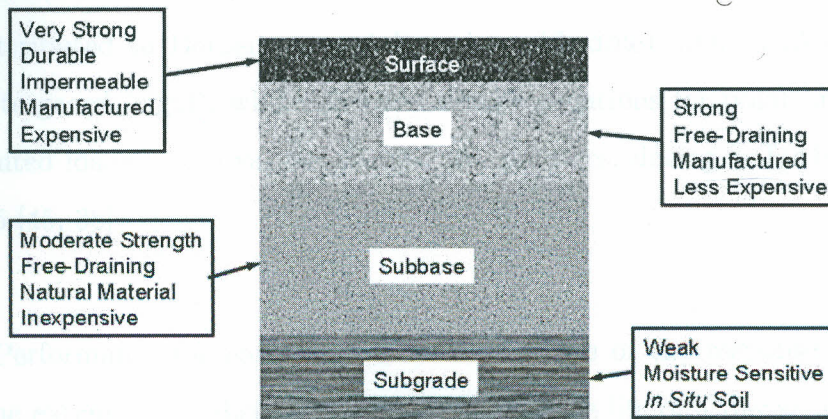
Typical pavement profile (after von Quintus[35])
